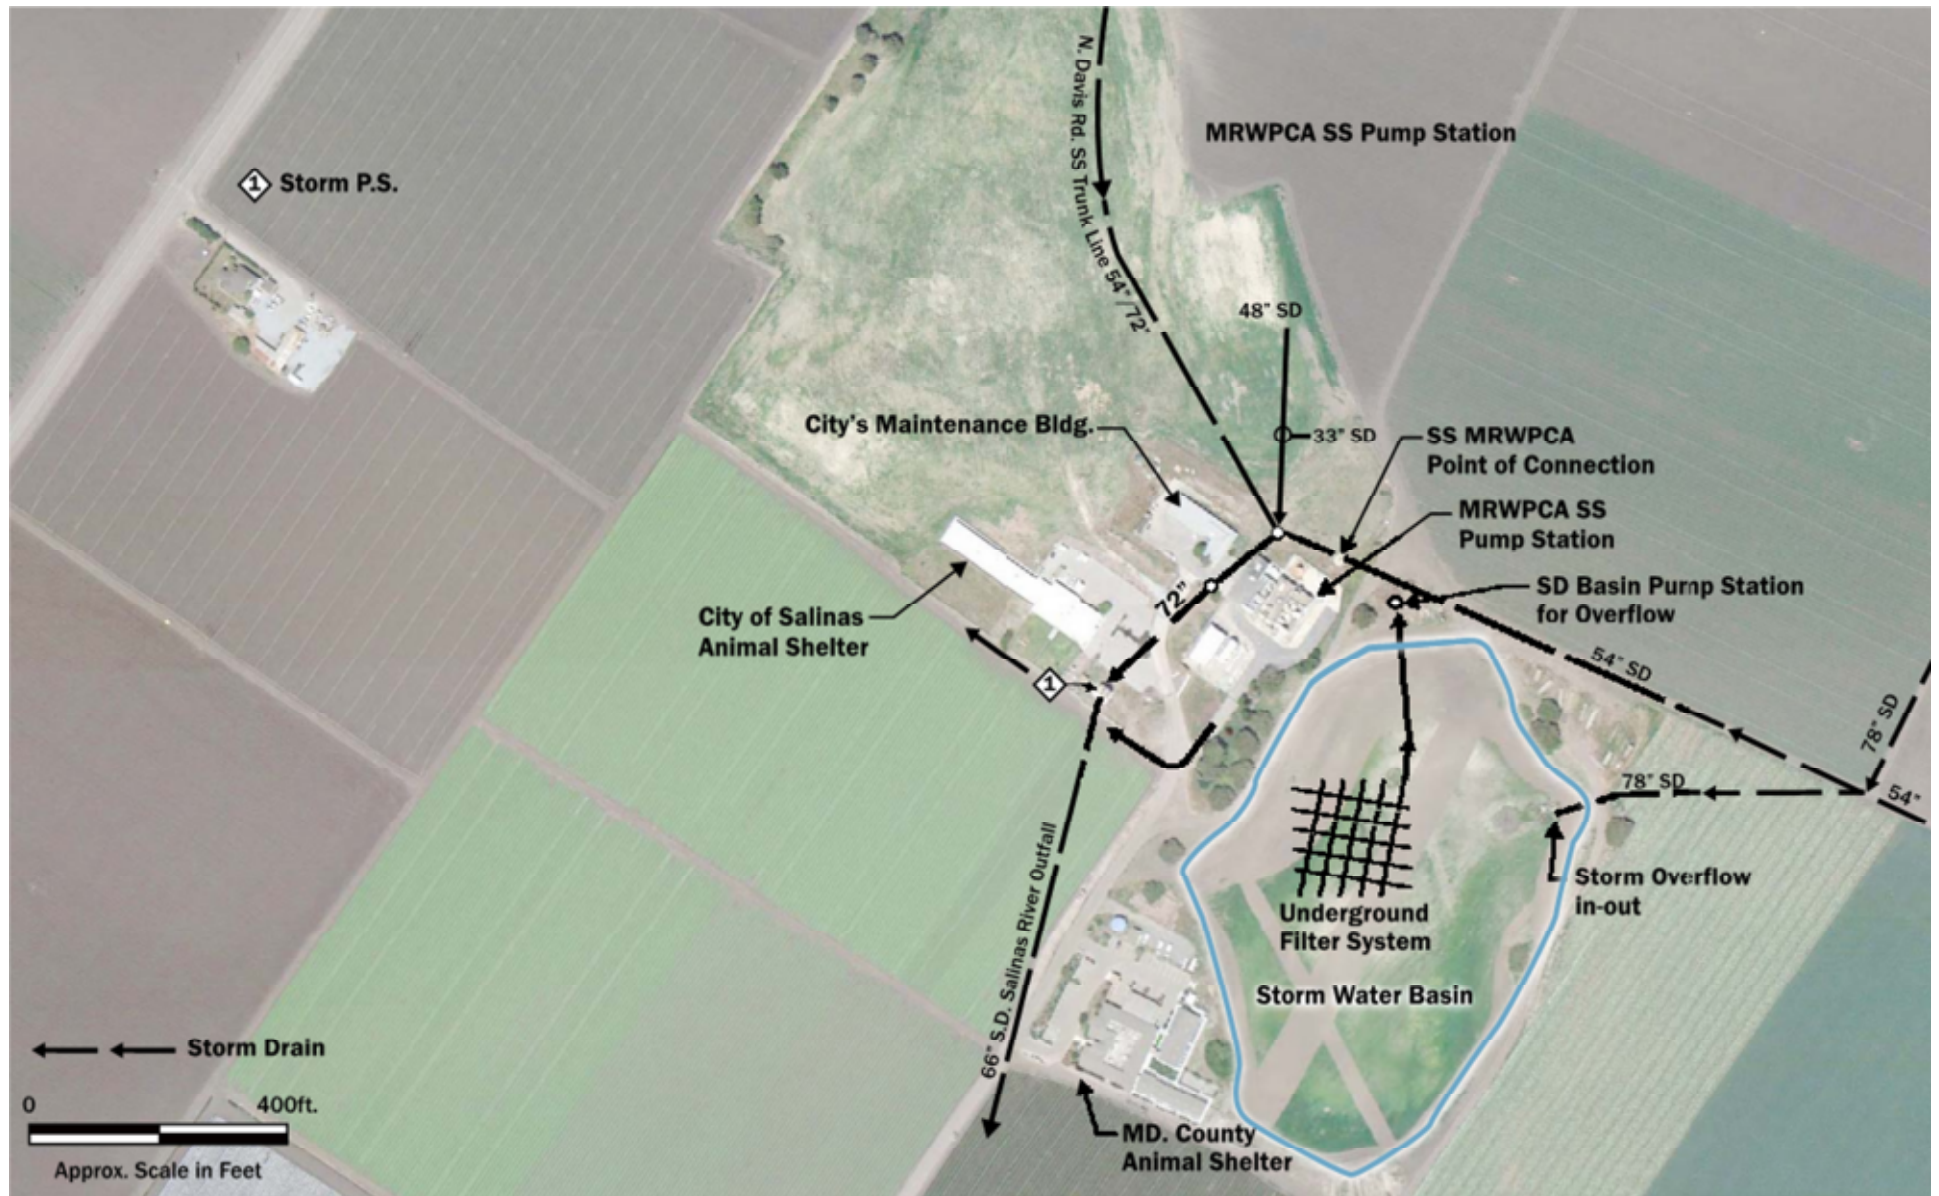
Project 1 Site for South Salinas Stormwater Diversion, Existing Storm Drain (SD) System and Existing Sanitary Sewer (SS) TP1 Pump Station
